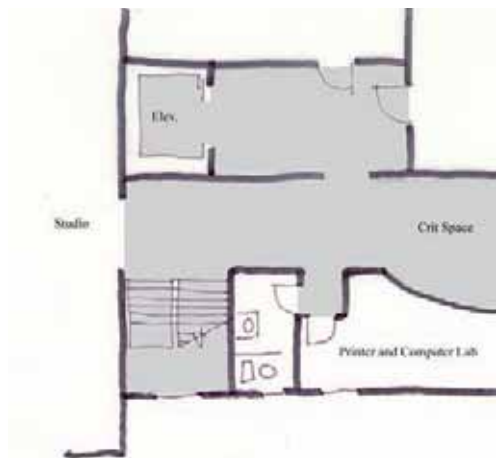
First Floor, Carpenter Hall at WSU Second Floor
